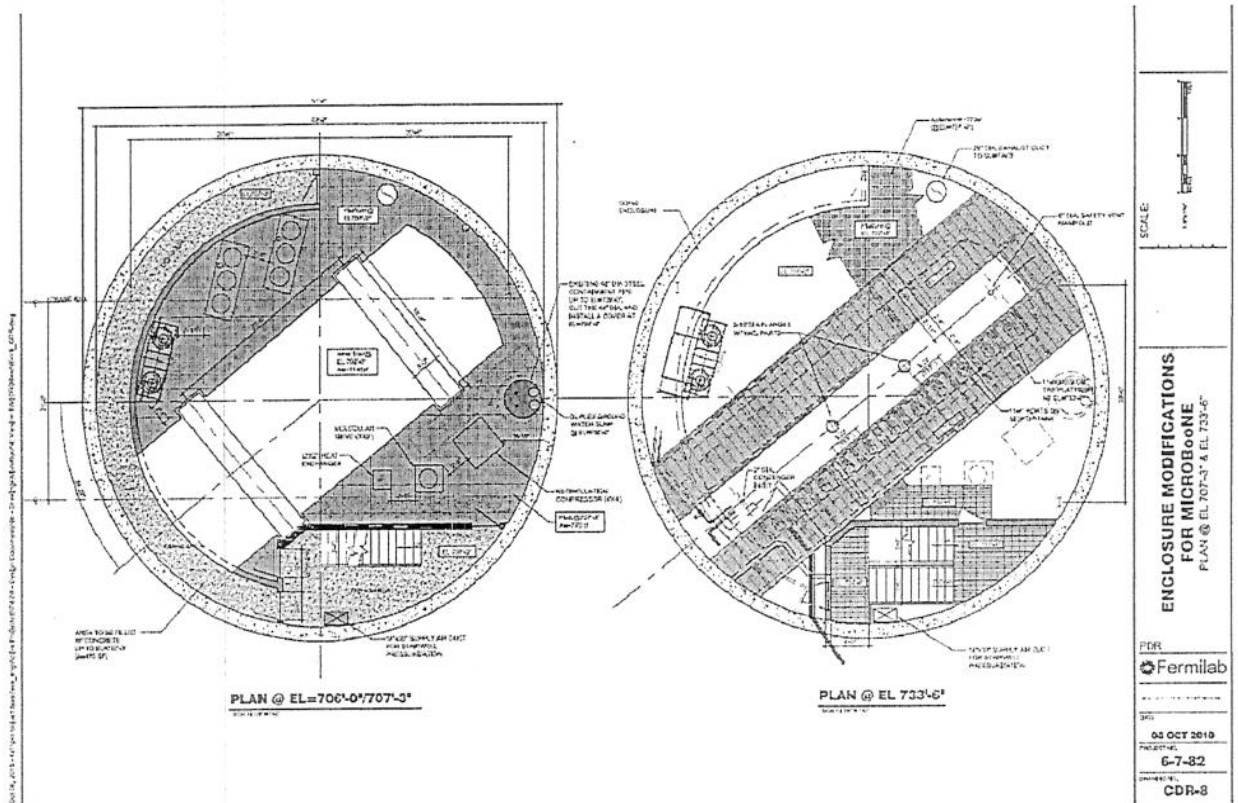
Plan views of the pit floor and the walkways at the top of the cryostat.
